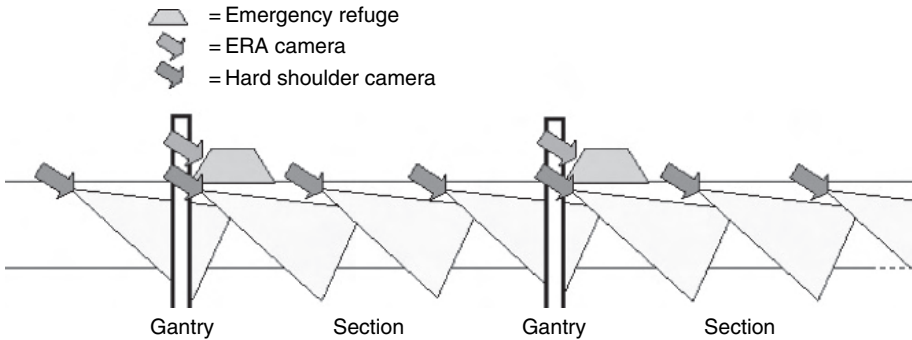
Schematic plan of an ATM hard shoulder section demonstrating hard shoulder and ERA camera positions and fields of view.
